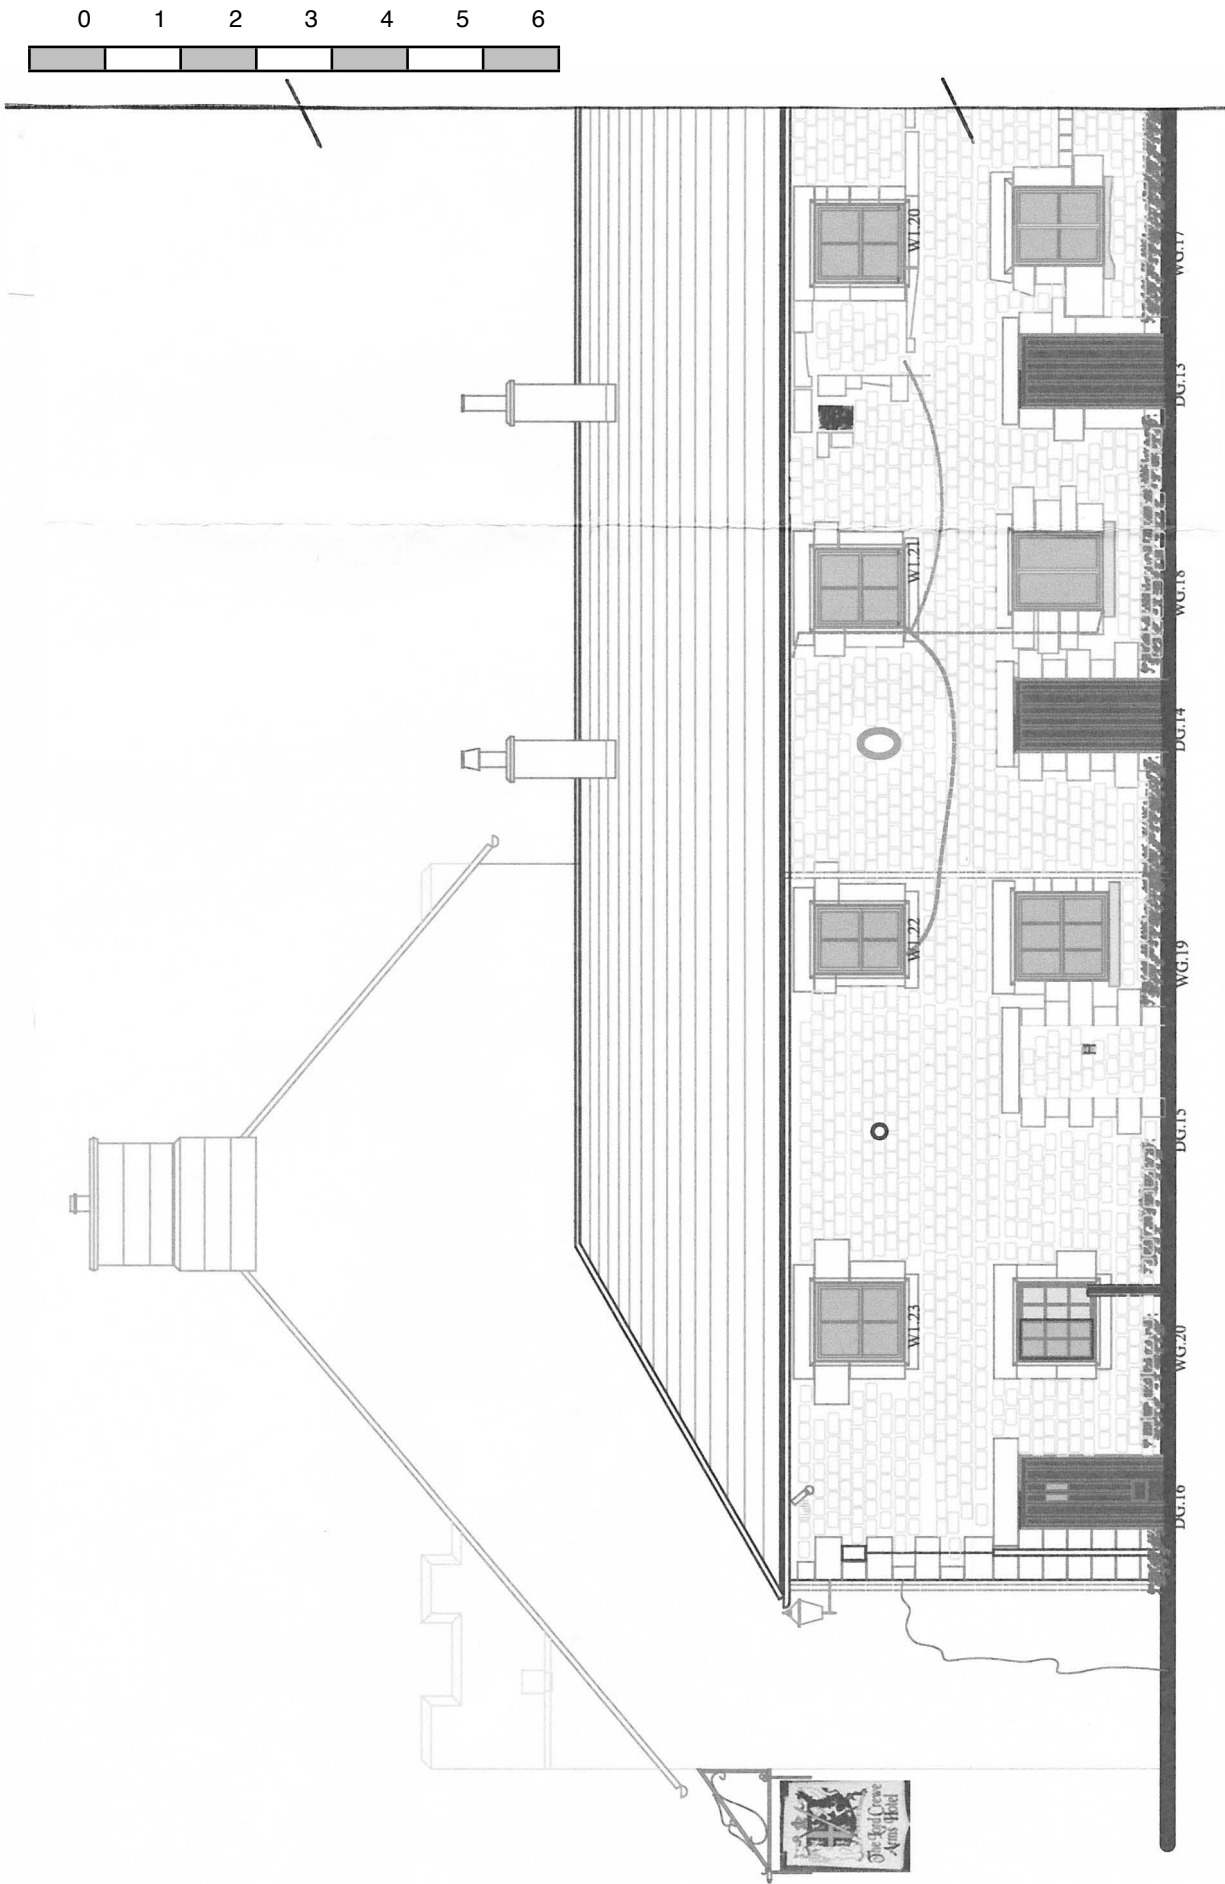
SOUTH ELEVATION WEST END COTTAGES
